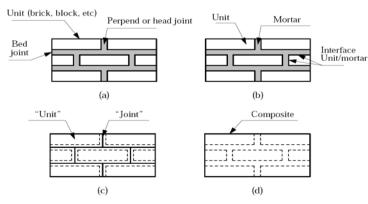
Modeling strategies for Brick Masonry: (a) typical masonry sample, (b) detailed micro modeling, (c) simplified micro-modeling, (d) macro-modeling (Lourencho 1996)
